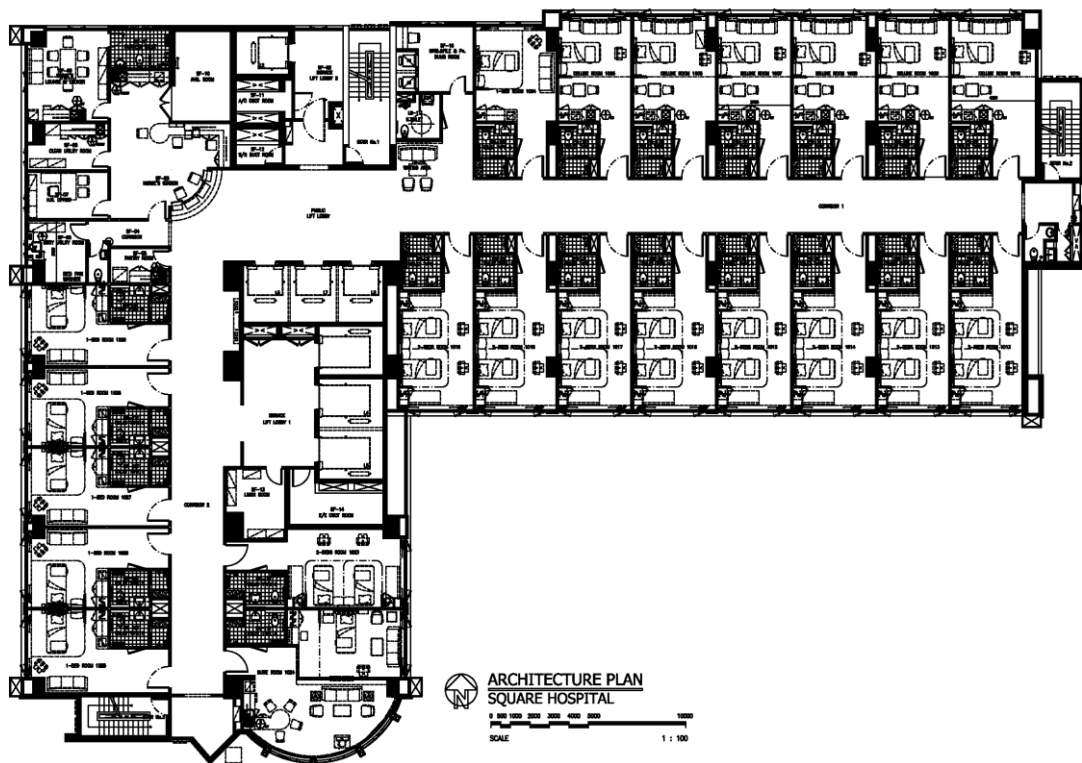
Architectural plan of 10th floor of Square Hospital (courtesy: SHL).
